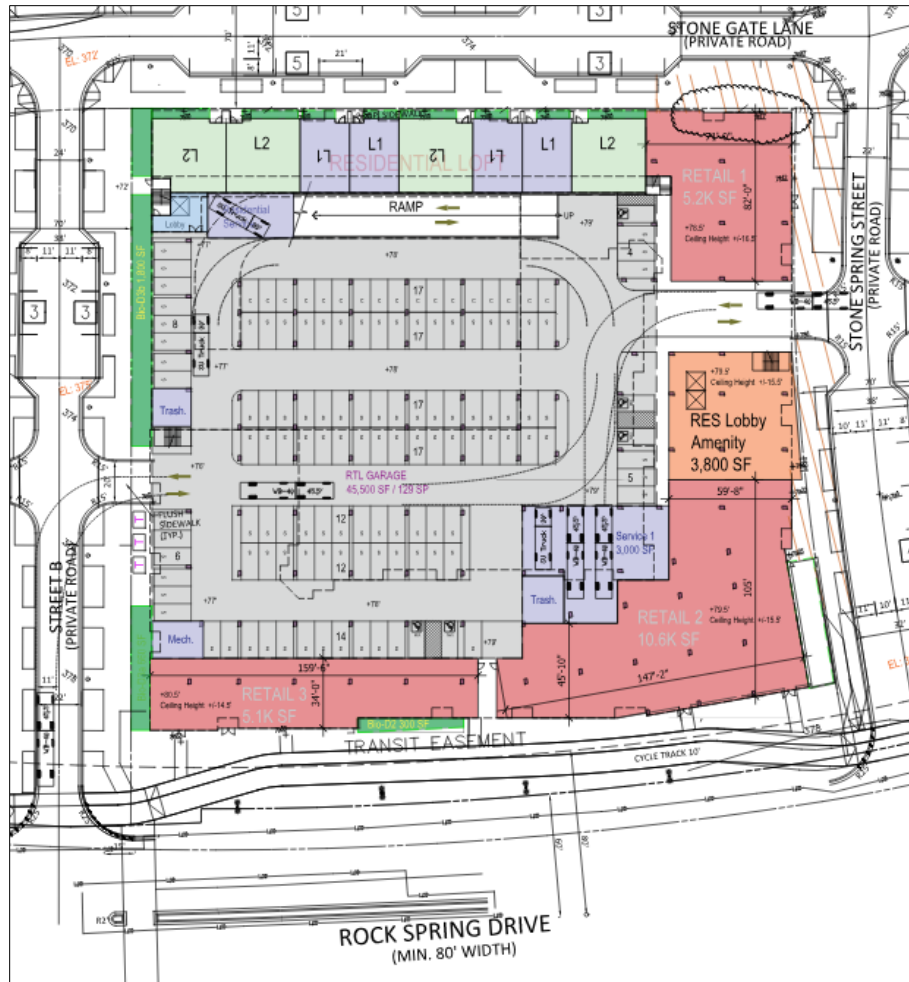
Parcel N Mixed-Use Building, Ground Floor Plan
